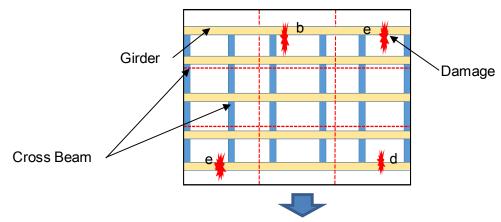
Corrosion (Cross Beam of Truss)
